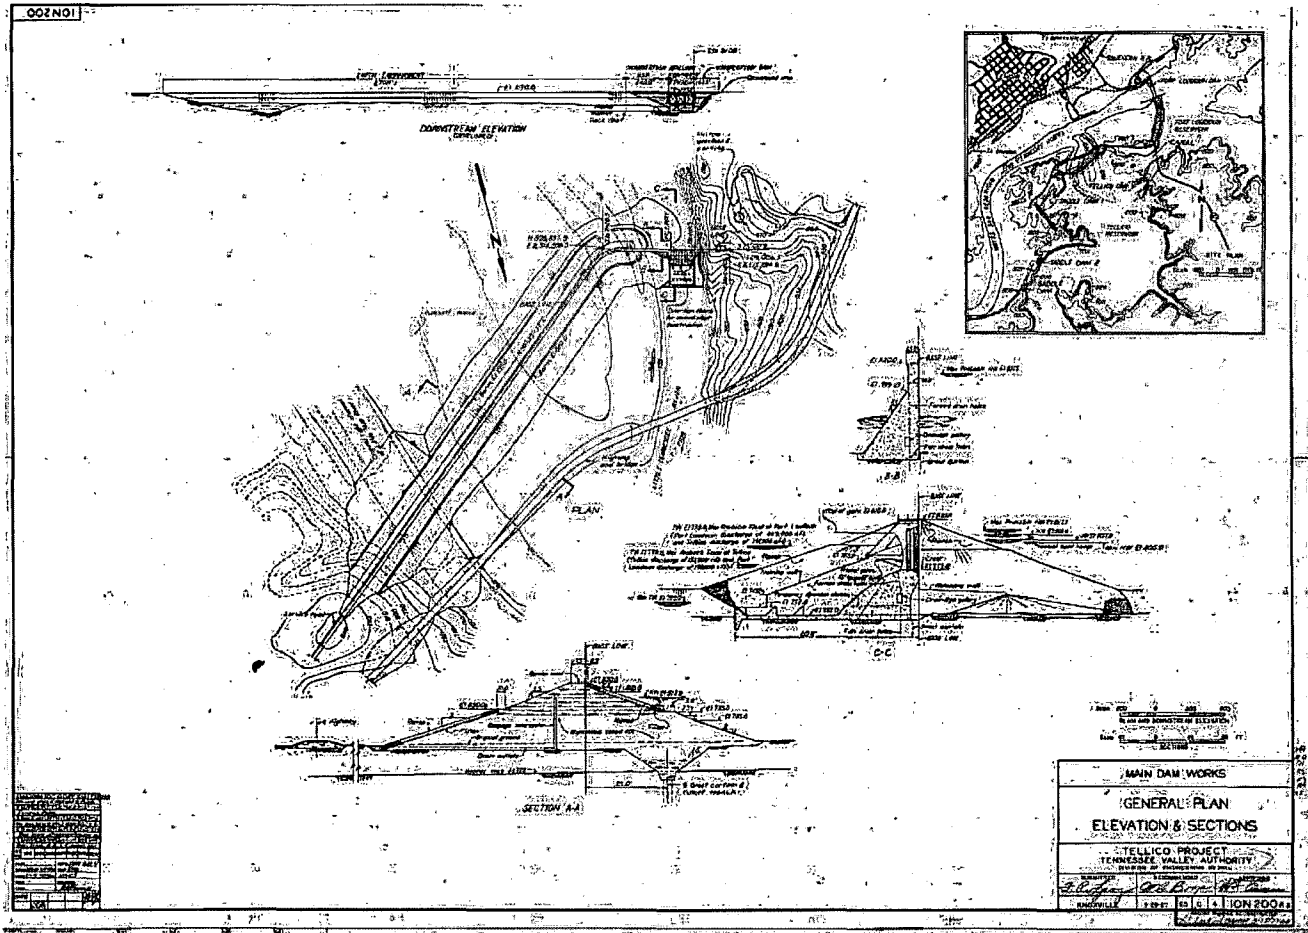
Tellico Dam Plan and Elevations (Ref. 2.1.1, Att. E1)
